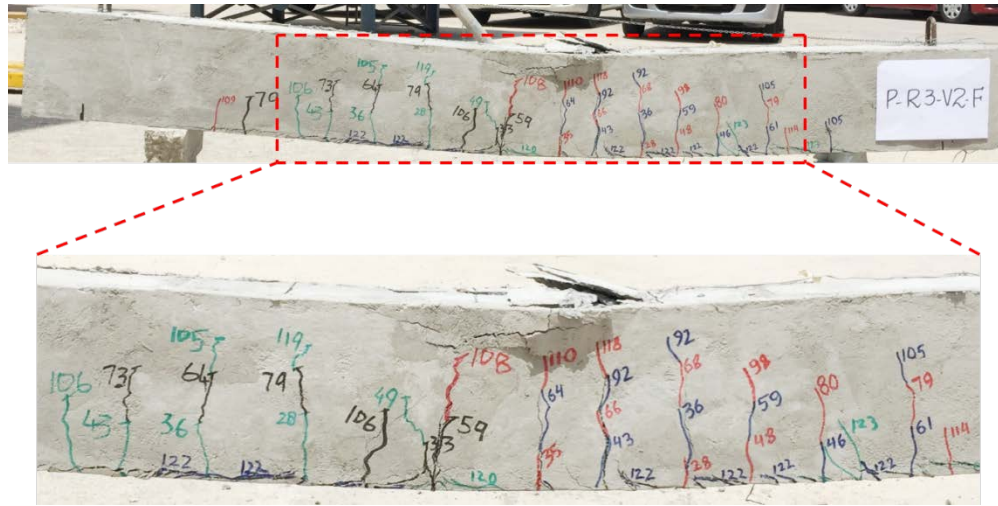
Mode of failure and crack patterns for test beam P-R3-V2-F
